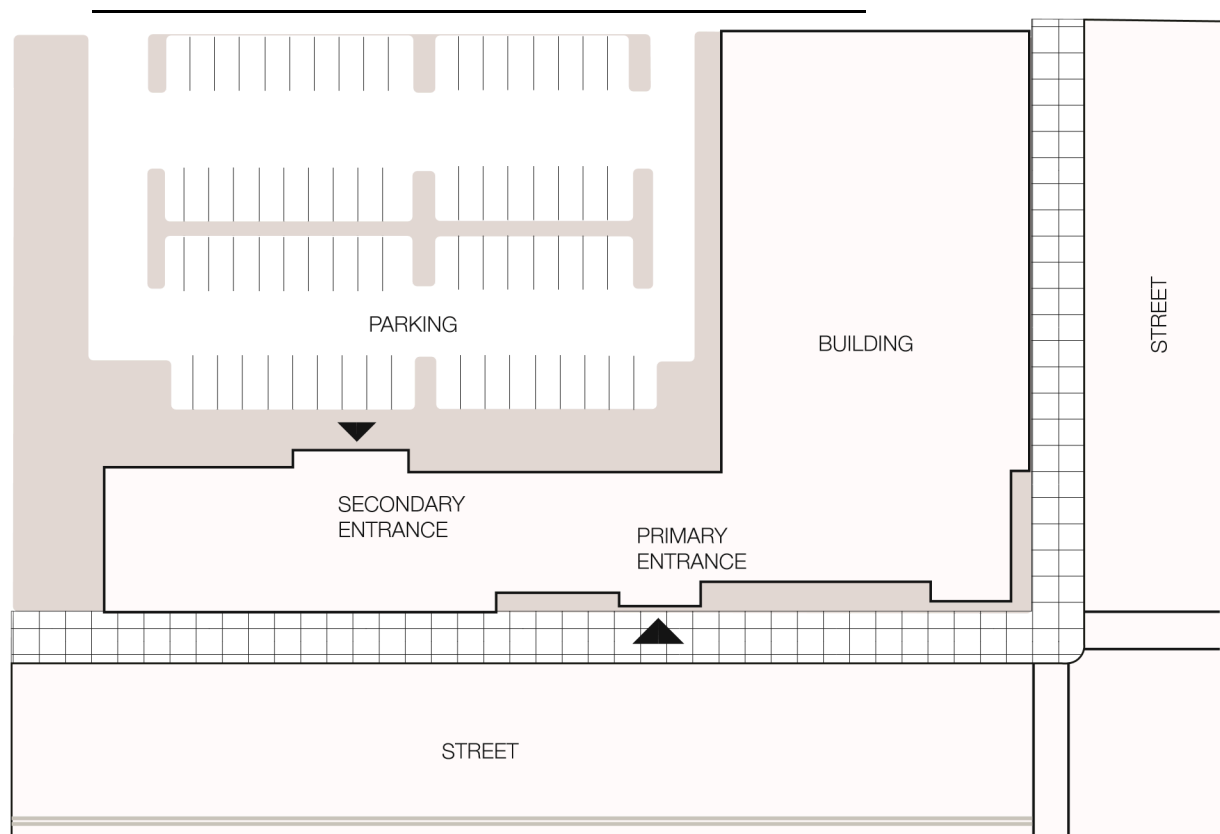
This image shows how parking is located in the inner part of the block to allow buildings to create a continuous sidewalk and street edge. Primary entrances are on the public sidewalk with alternative entrances adjacent to the parking.
